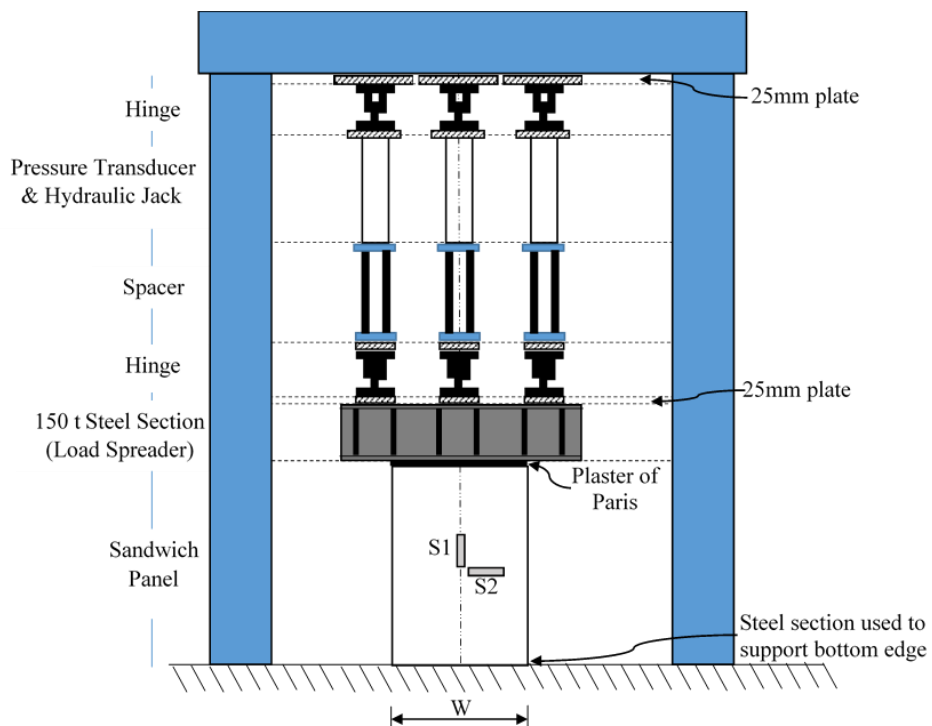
Instrumentation and test configuration – strain gauges on back side of concrete wythe (front elevation)
